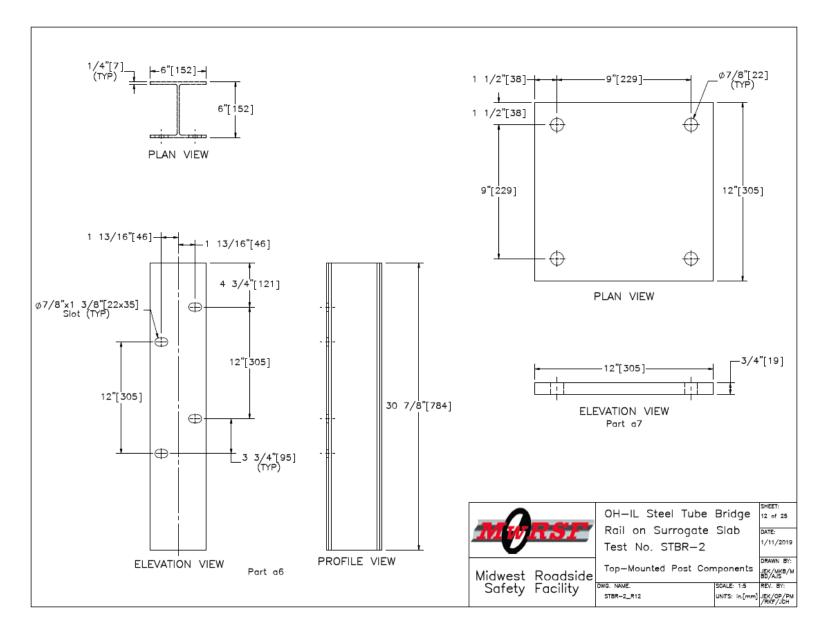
Top-Mounted Post Components, Test No. STBR-2
